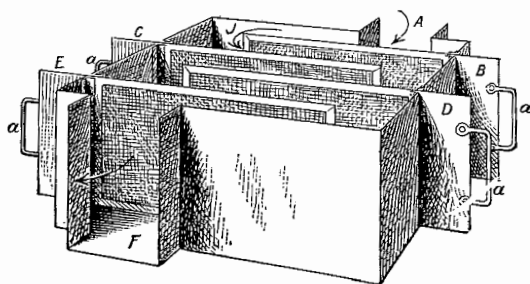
Quadrupled Air Cleanser, Using Cheese-Cloth on Metal Frames
